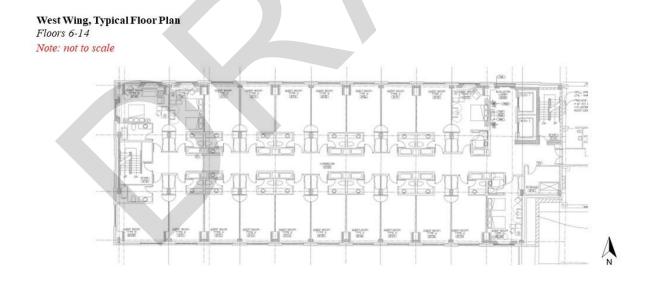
West Wing, Typical Floor Plan, Floors 6-14
